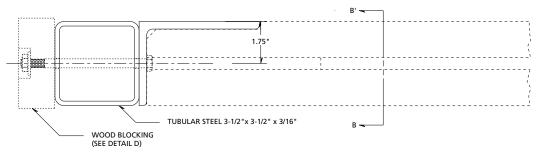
DETAIL POST ASSEMBLY 3-1/2" x 3-1/2" x 3/16" FRONT ELEVATION
